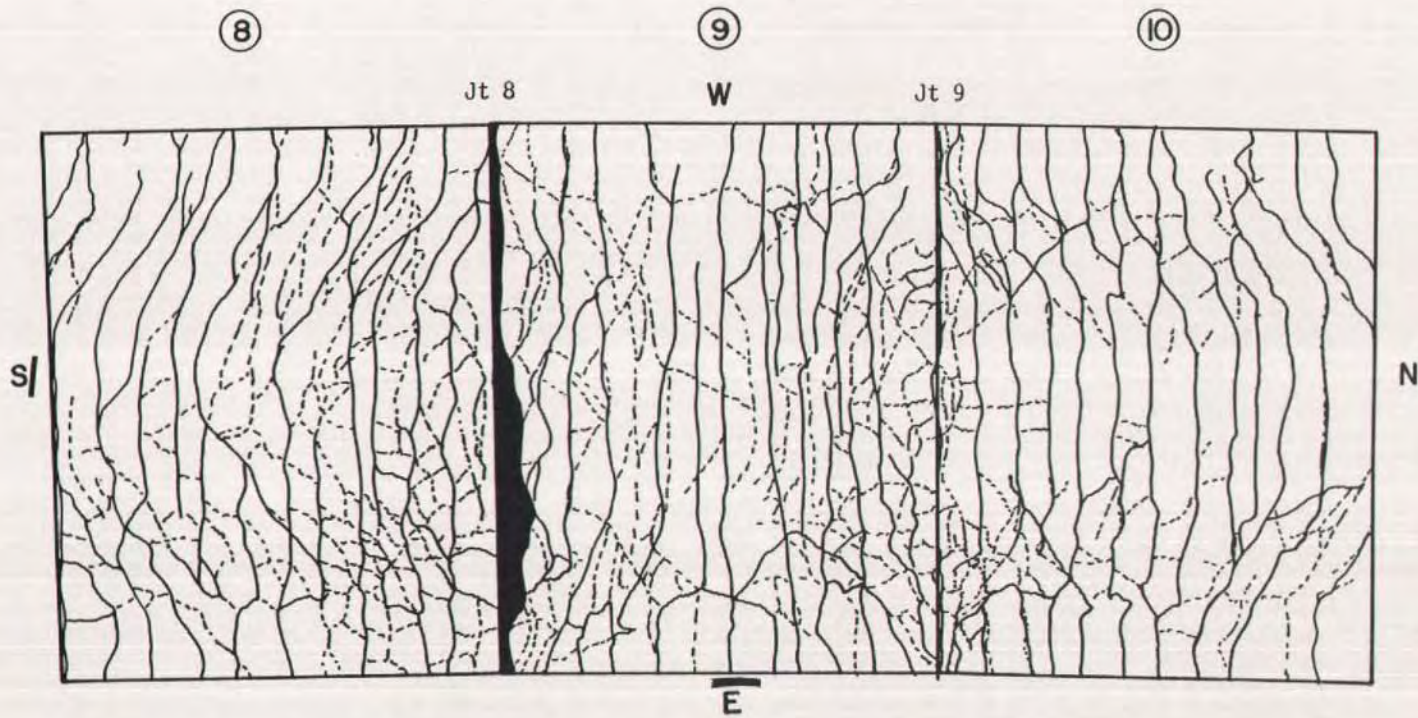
Outside crack pattern for bottom of Girder B at failure.
